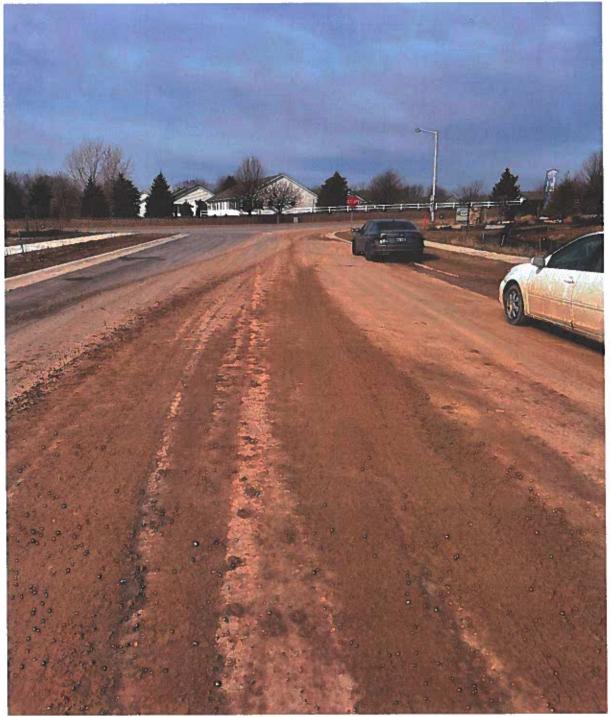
Tracking due to lack of controls at construction entrances. Stone needs to be installed and maintained to help eliminate tracking.
